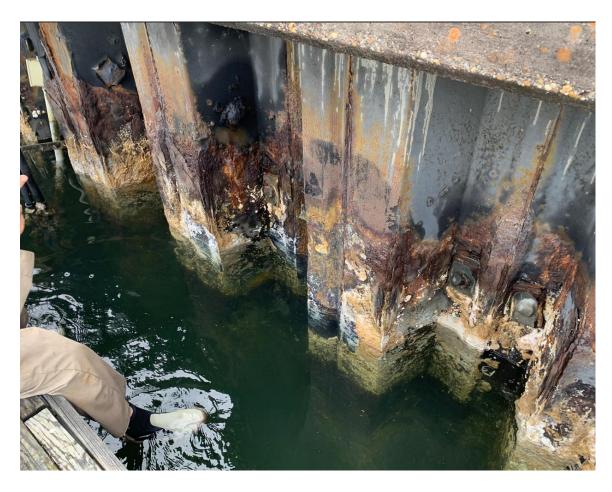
Severe corrosion in west wall (Port Royal Side)
